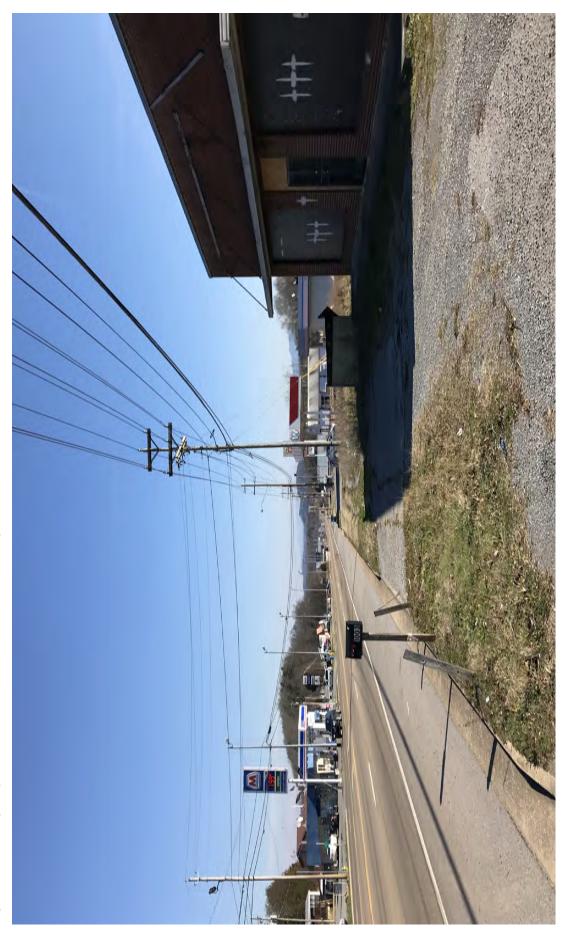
West Highway 25/70 at New Cave Church Road: Existing Conditions
